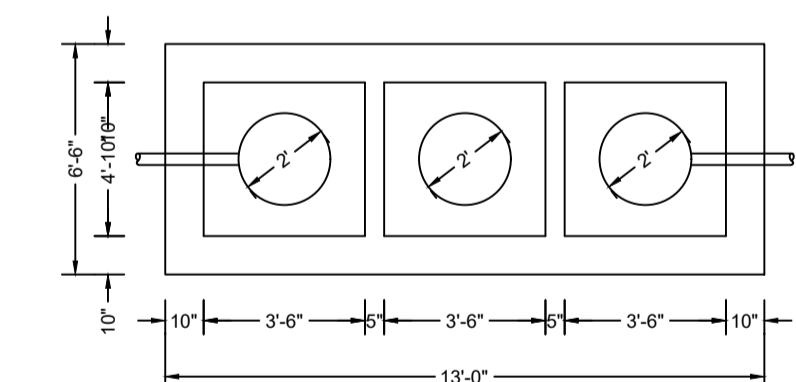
DETAILS OF COLUMN FOUNDATION (SCALE - 1" = 2'-0")
